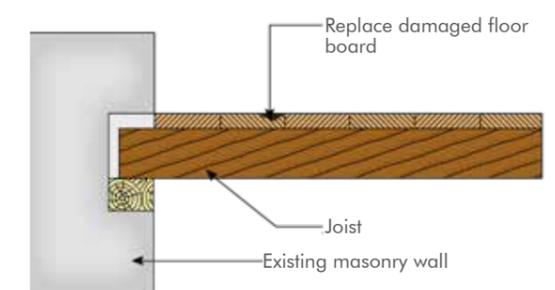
Detail of wooden flooring, Source: IS: 3670- 1989
